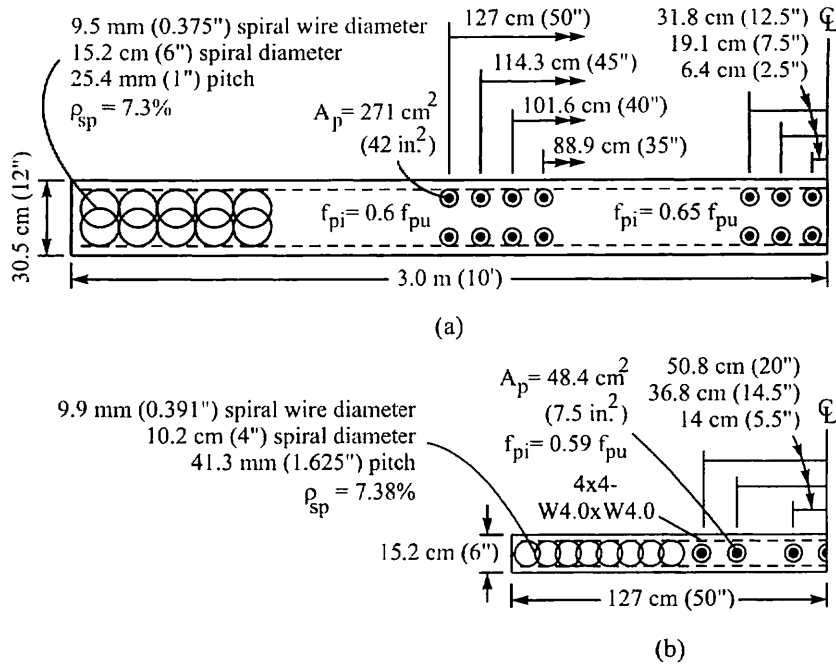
(a) Cross-section at the base of full-scale wall (adapted from Ref. (5)); (b) Cross-section at the base of scaled and test walls.
